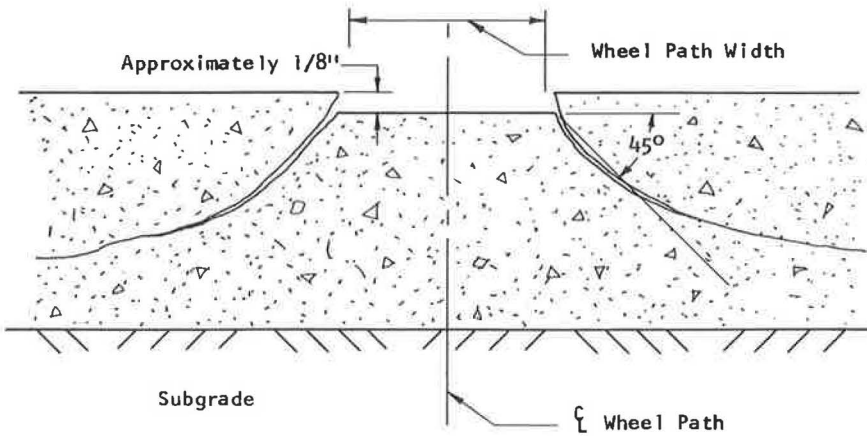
Test pavement 1, test set III: section through wheelpath in area of failure after approximately 15,000 load applications.
